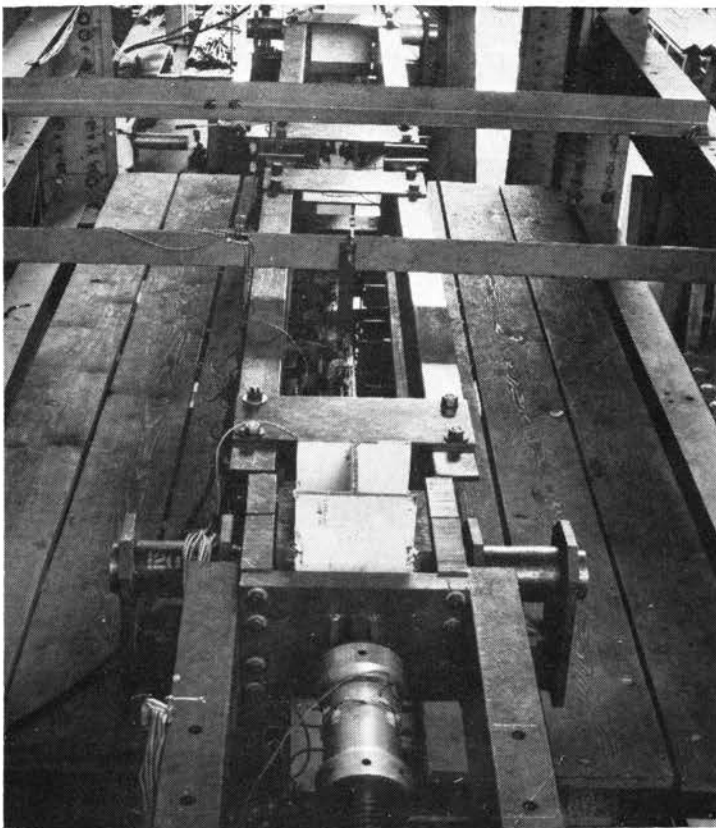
Detailed view of strut between columns tops—an interior column is in the foreground
